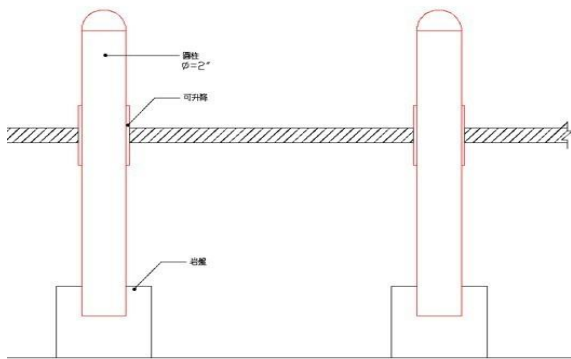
Elevation-South Star Project (SSP) of Kaohsiung in Taiwan
